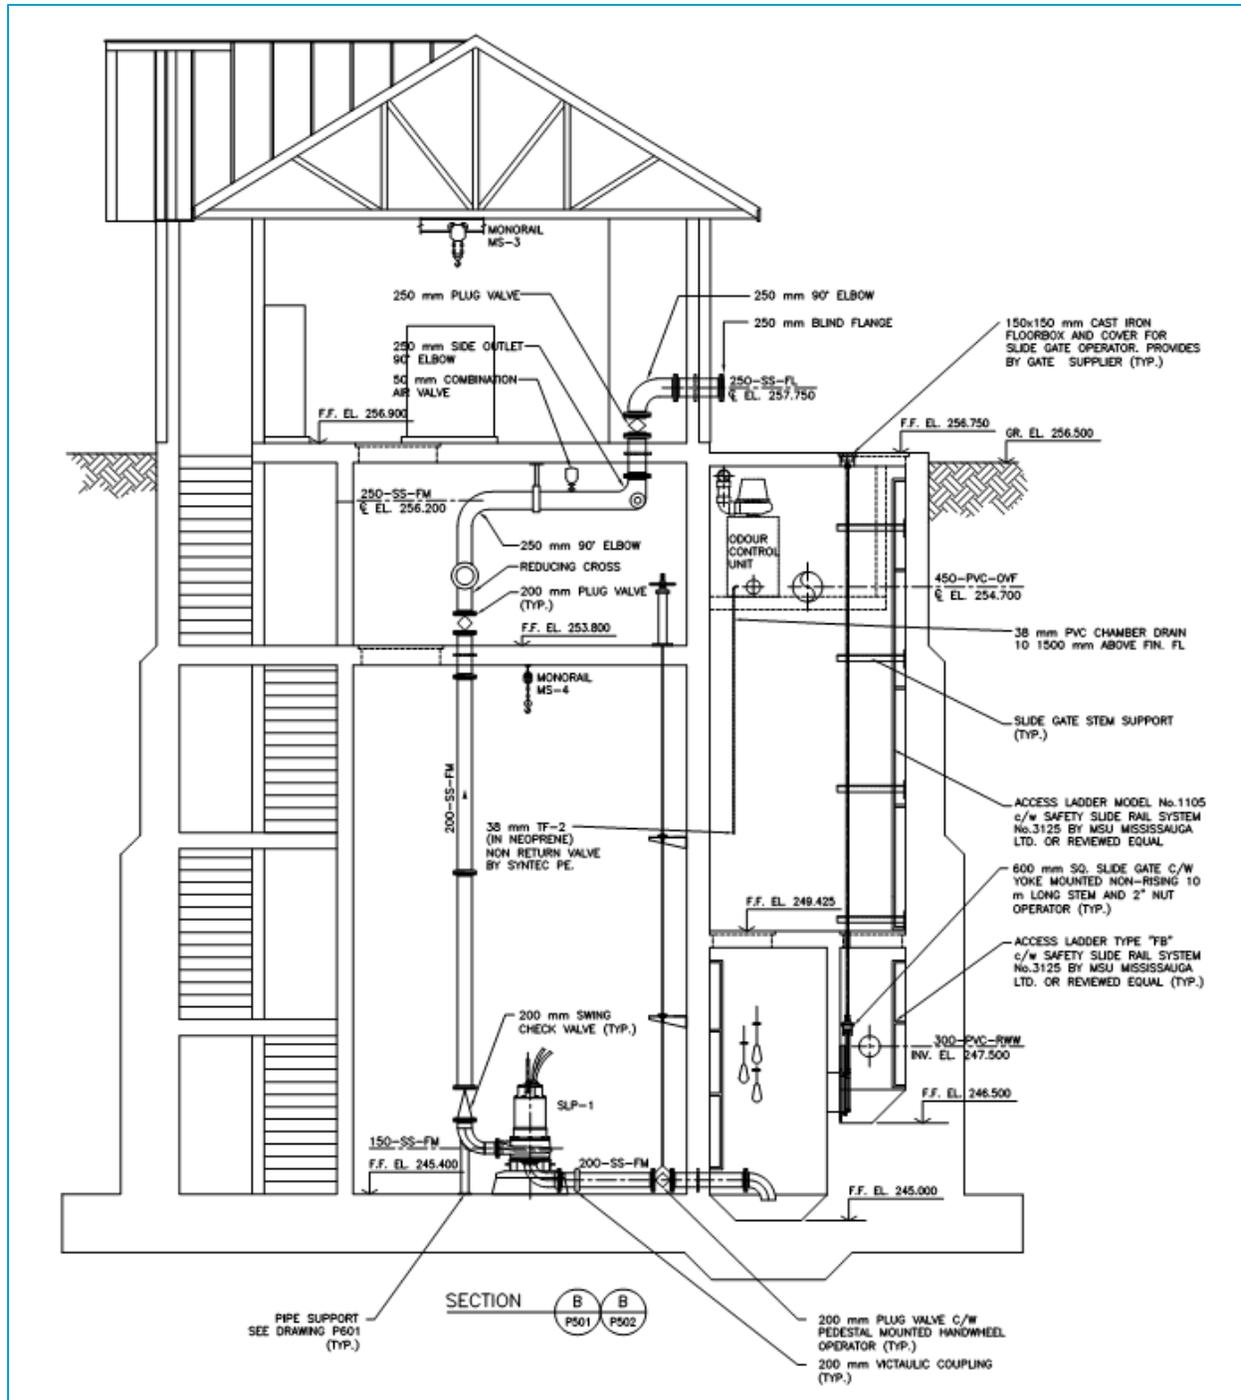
Section of Wet Well at Janet Avenue PS (As-Built Drawings, 2012)
